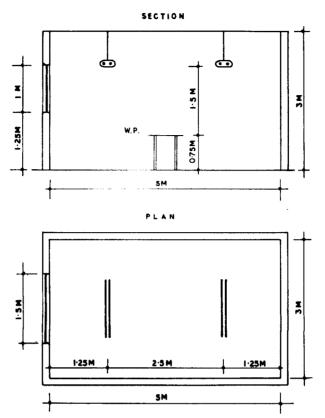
DISTRIBUTION OF TWIN LAMP LUMINAIRES ON SECTION AND PLAN (EXAMPLE 26)
